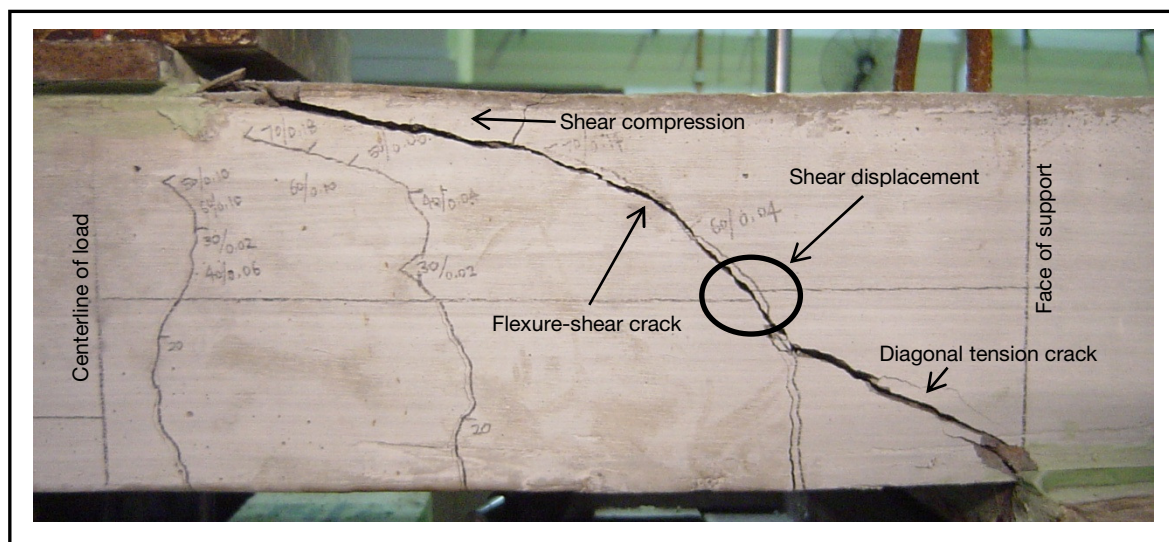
Typical crack pattern of lightweight concrete beam
